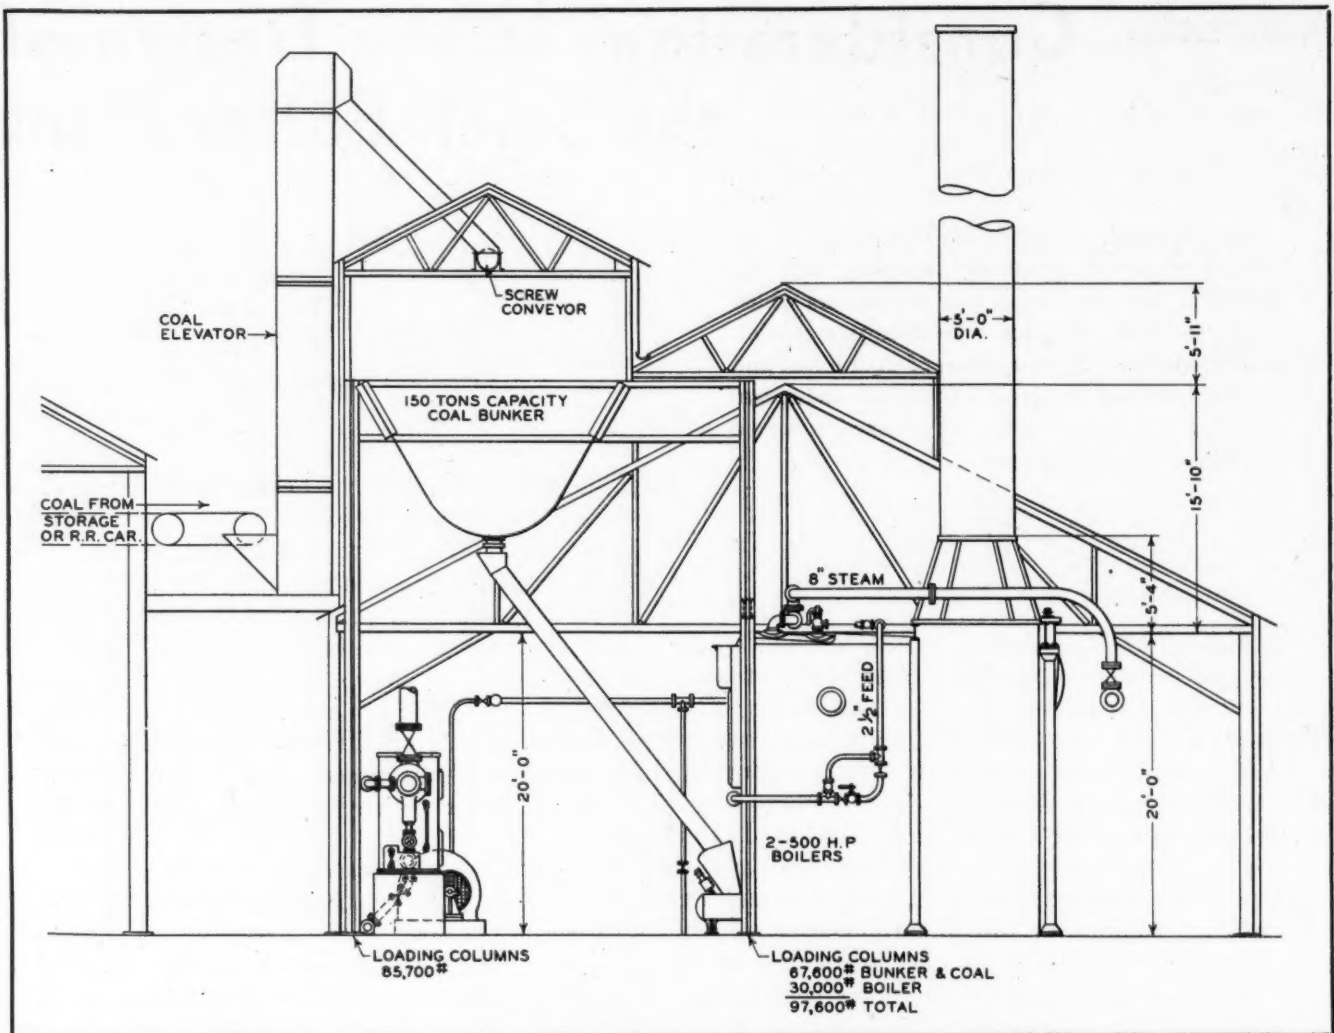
General arrangement of plant—Pittsburgh Spring & Steel Company.
